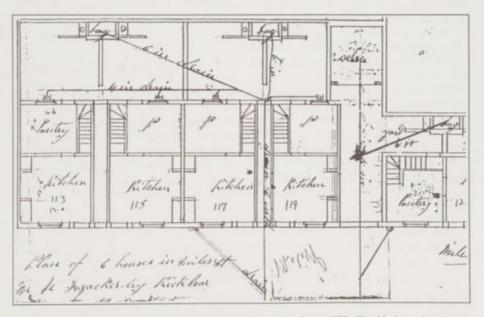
Part of a building plan for six houses and a stable in Miles Street, 1875. (This block stood on the site now occupied a car park between Emmanuel Church and the Spar shop on Plungington Road.)
